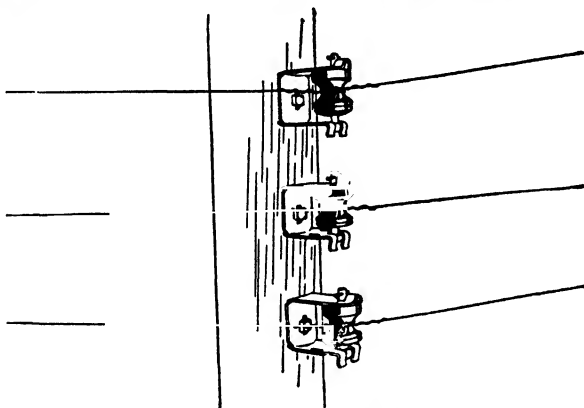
Three-wire secondary tied in to three separately supported Sagger brackets. (Courtesy Hubbard & Co.)
